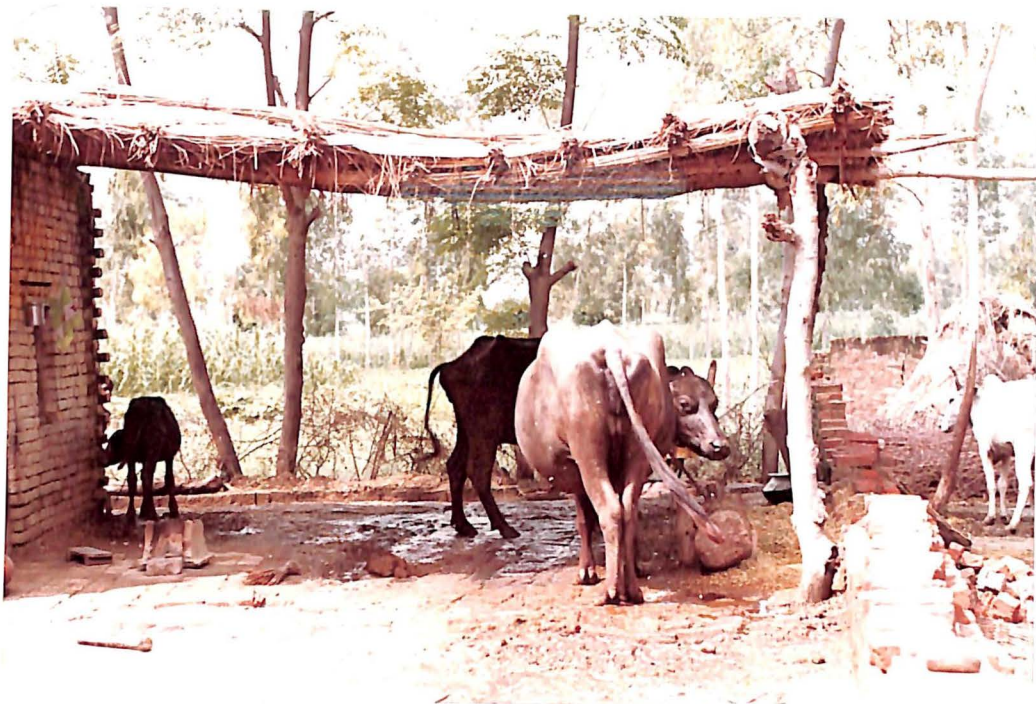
An improvised lean-to shelter with brick-lined floor.
